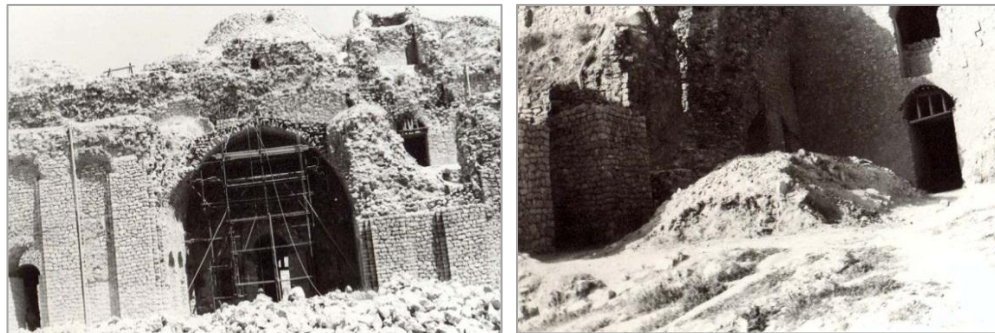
Left: rubble clearing from porch A. Right: creation and installation of wooden formwork
